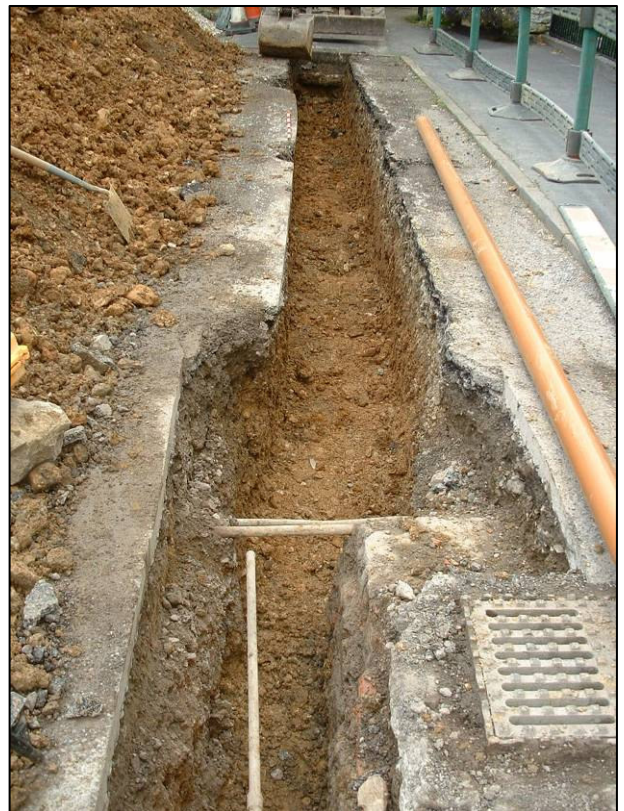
Excavated Trench 2 on north side of Market Place, looking west.
